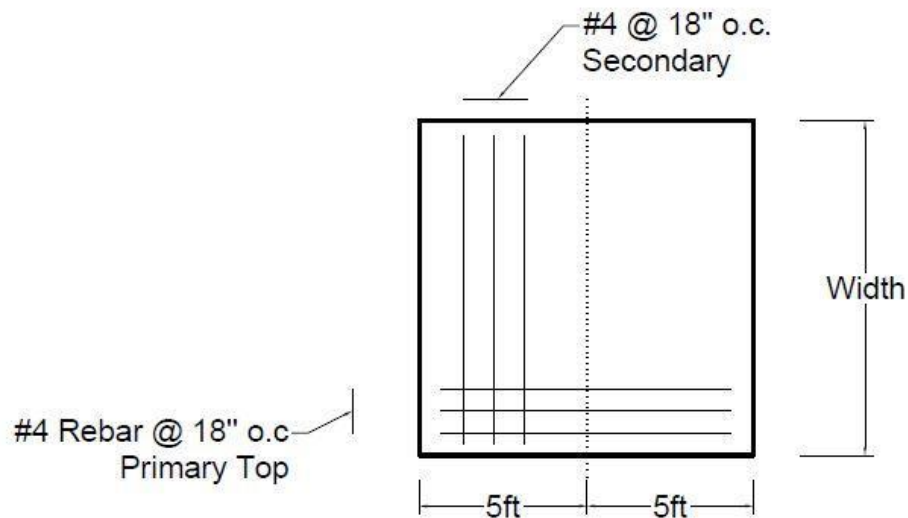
Slab with Primary and Secondary Reinforcement.
